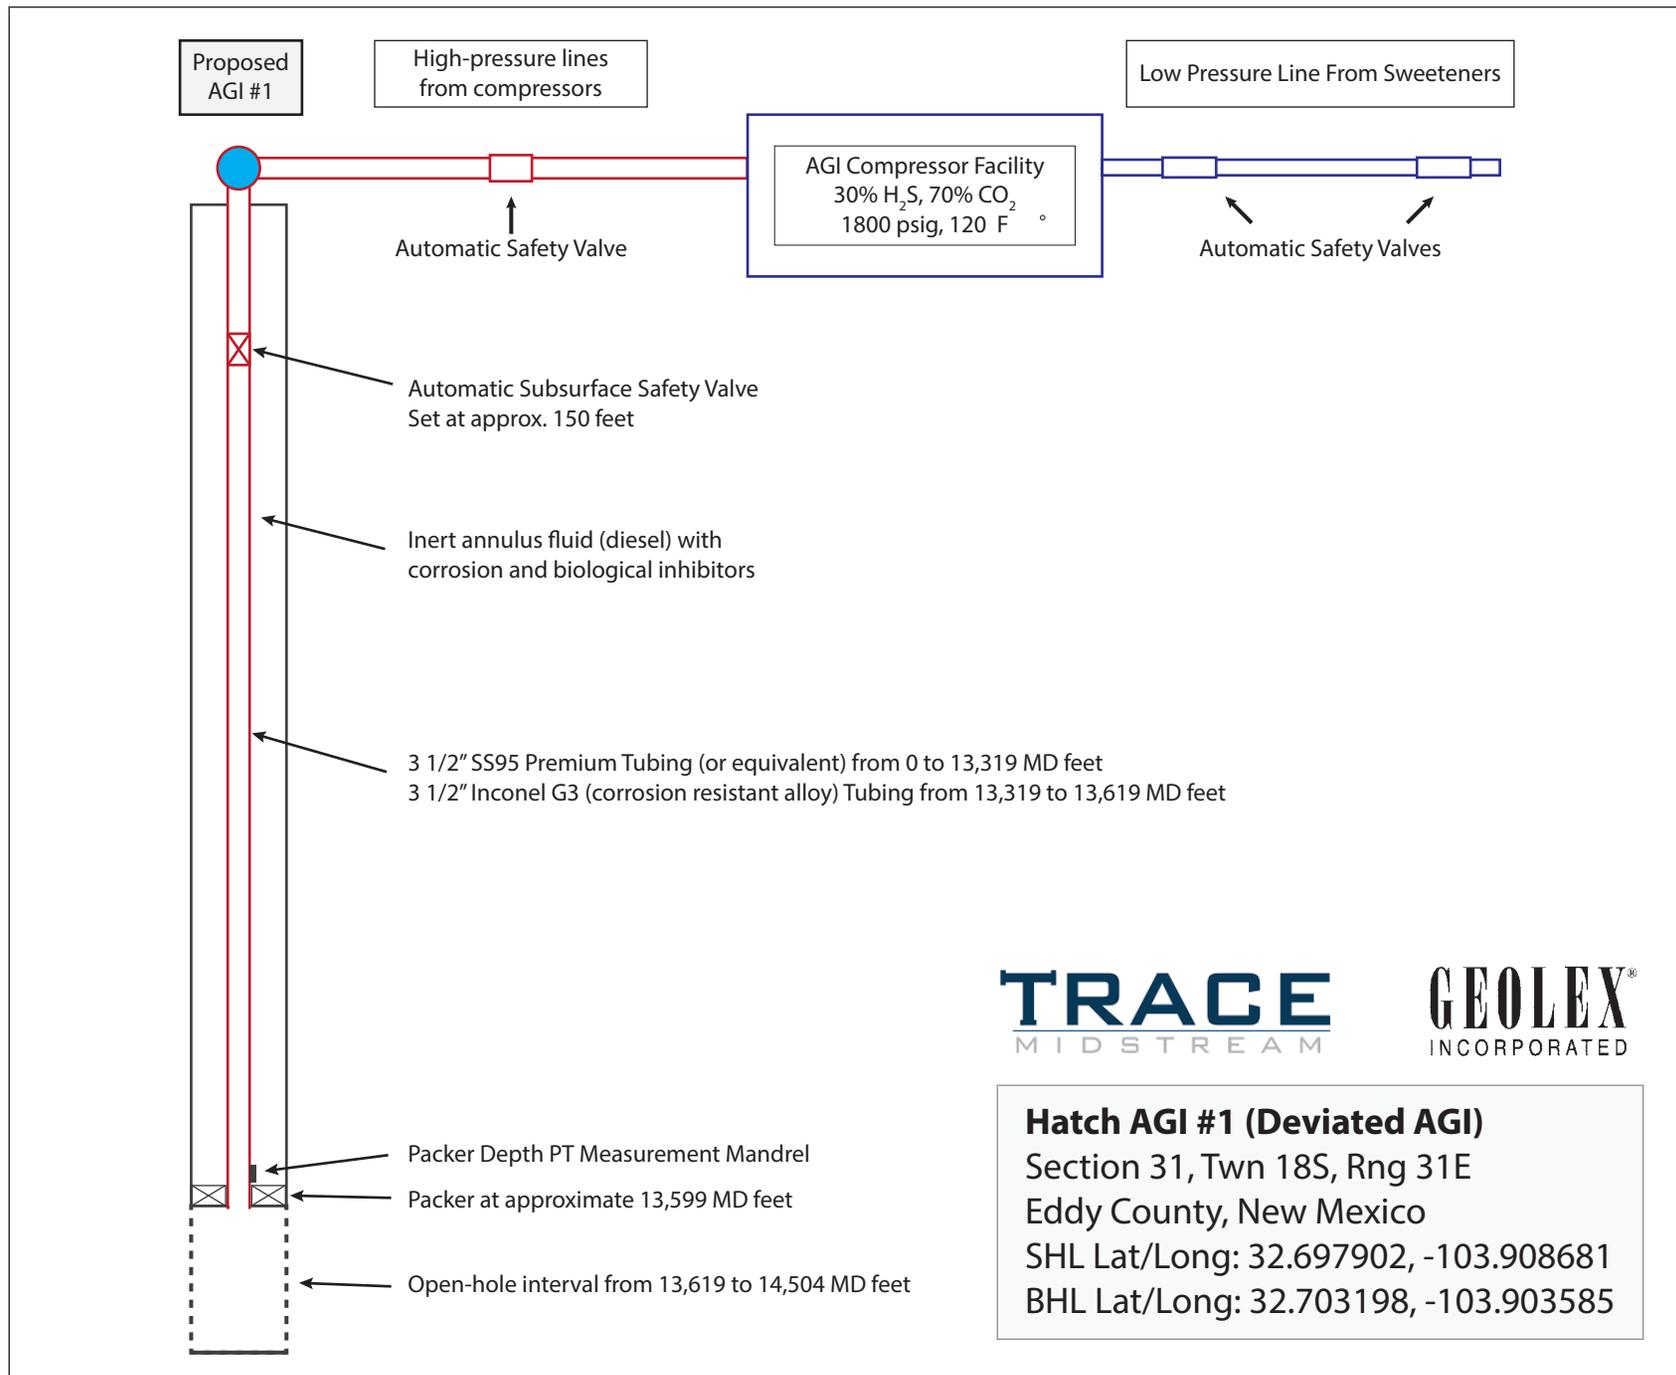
Schematic of surface facilities and proposed Hatch AGI #1
